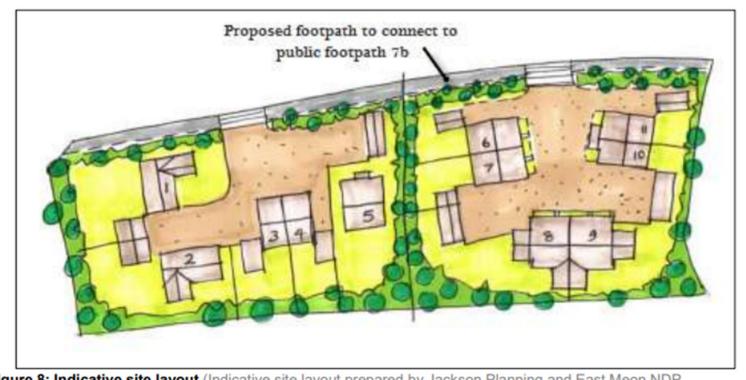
Indicative site layout (Indicative site layout prepared by Jackson Planning and East Meon NDP Working Team)
